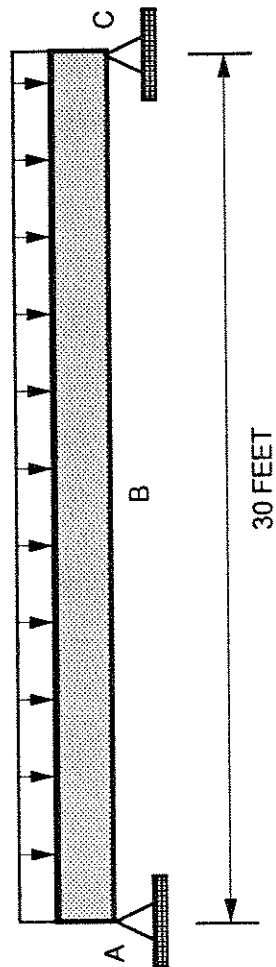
REINFORCED CONCRETE BEAM; GEOMETRY & MATERIAL PROPERTIES.
